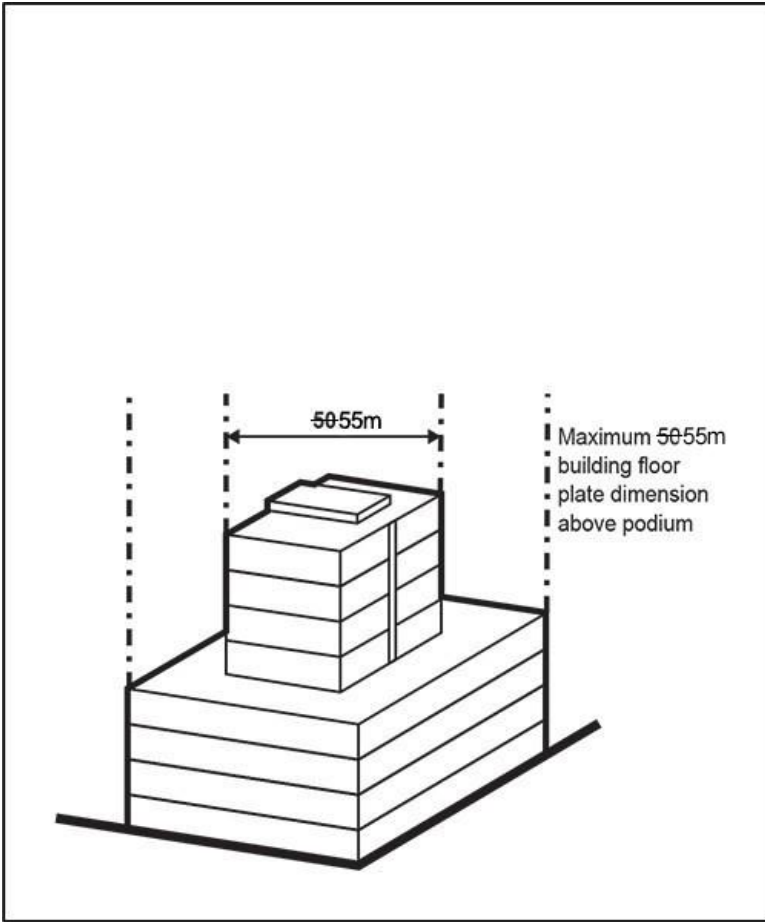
Maximum tower dimension plan view – illustration of Rule 4.5
